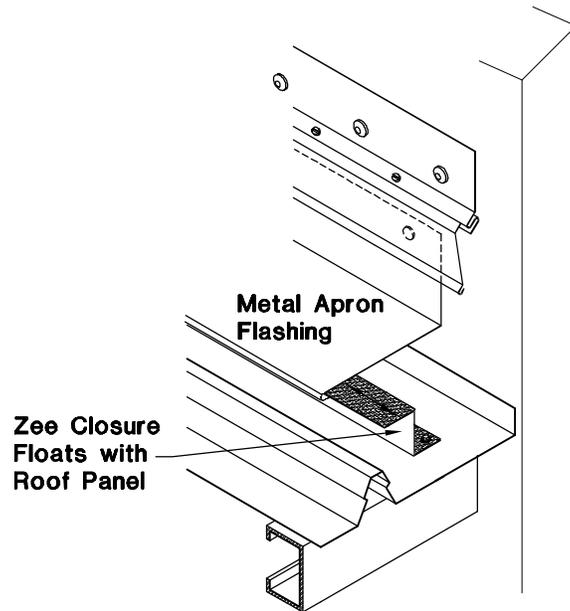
Wall Flashing with Wall Parallel to Panel Seams
